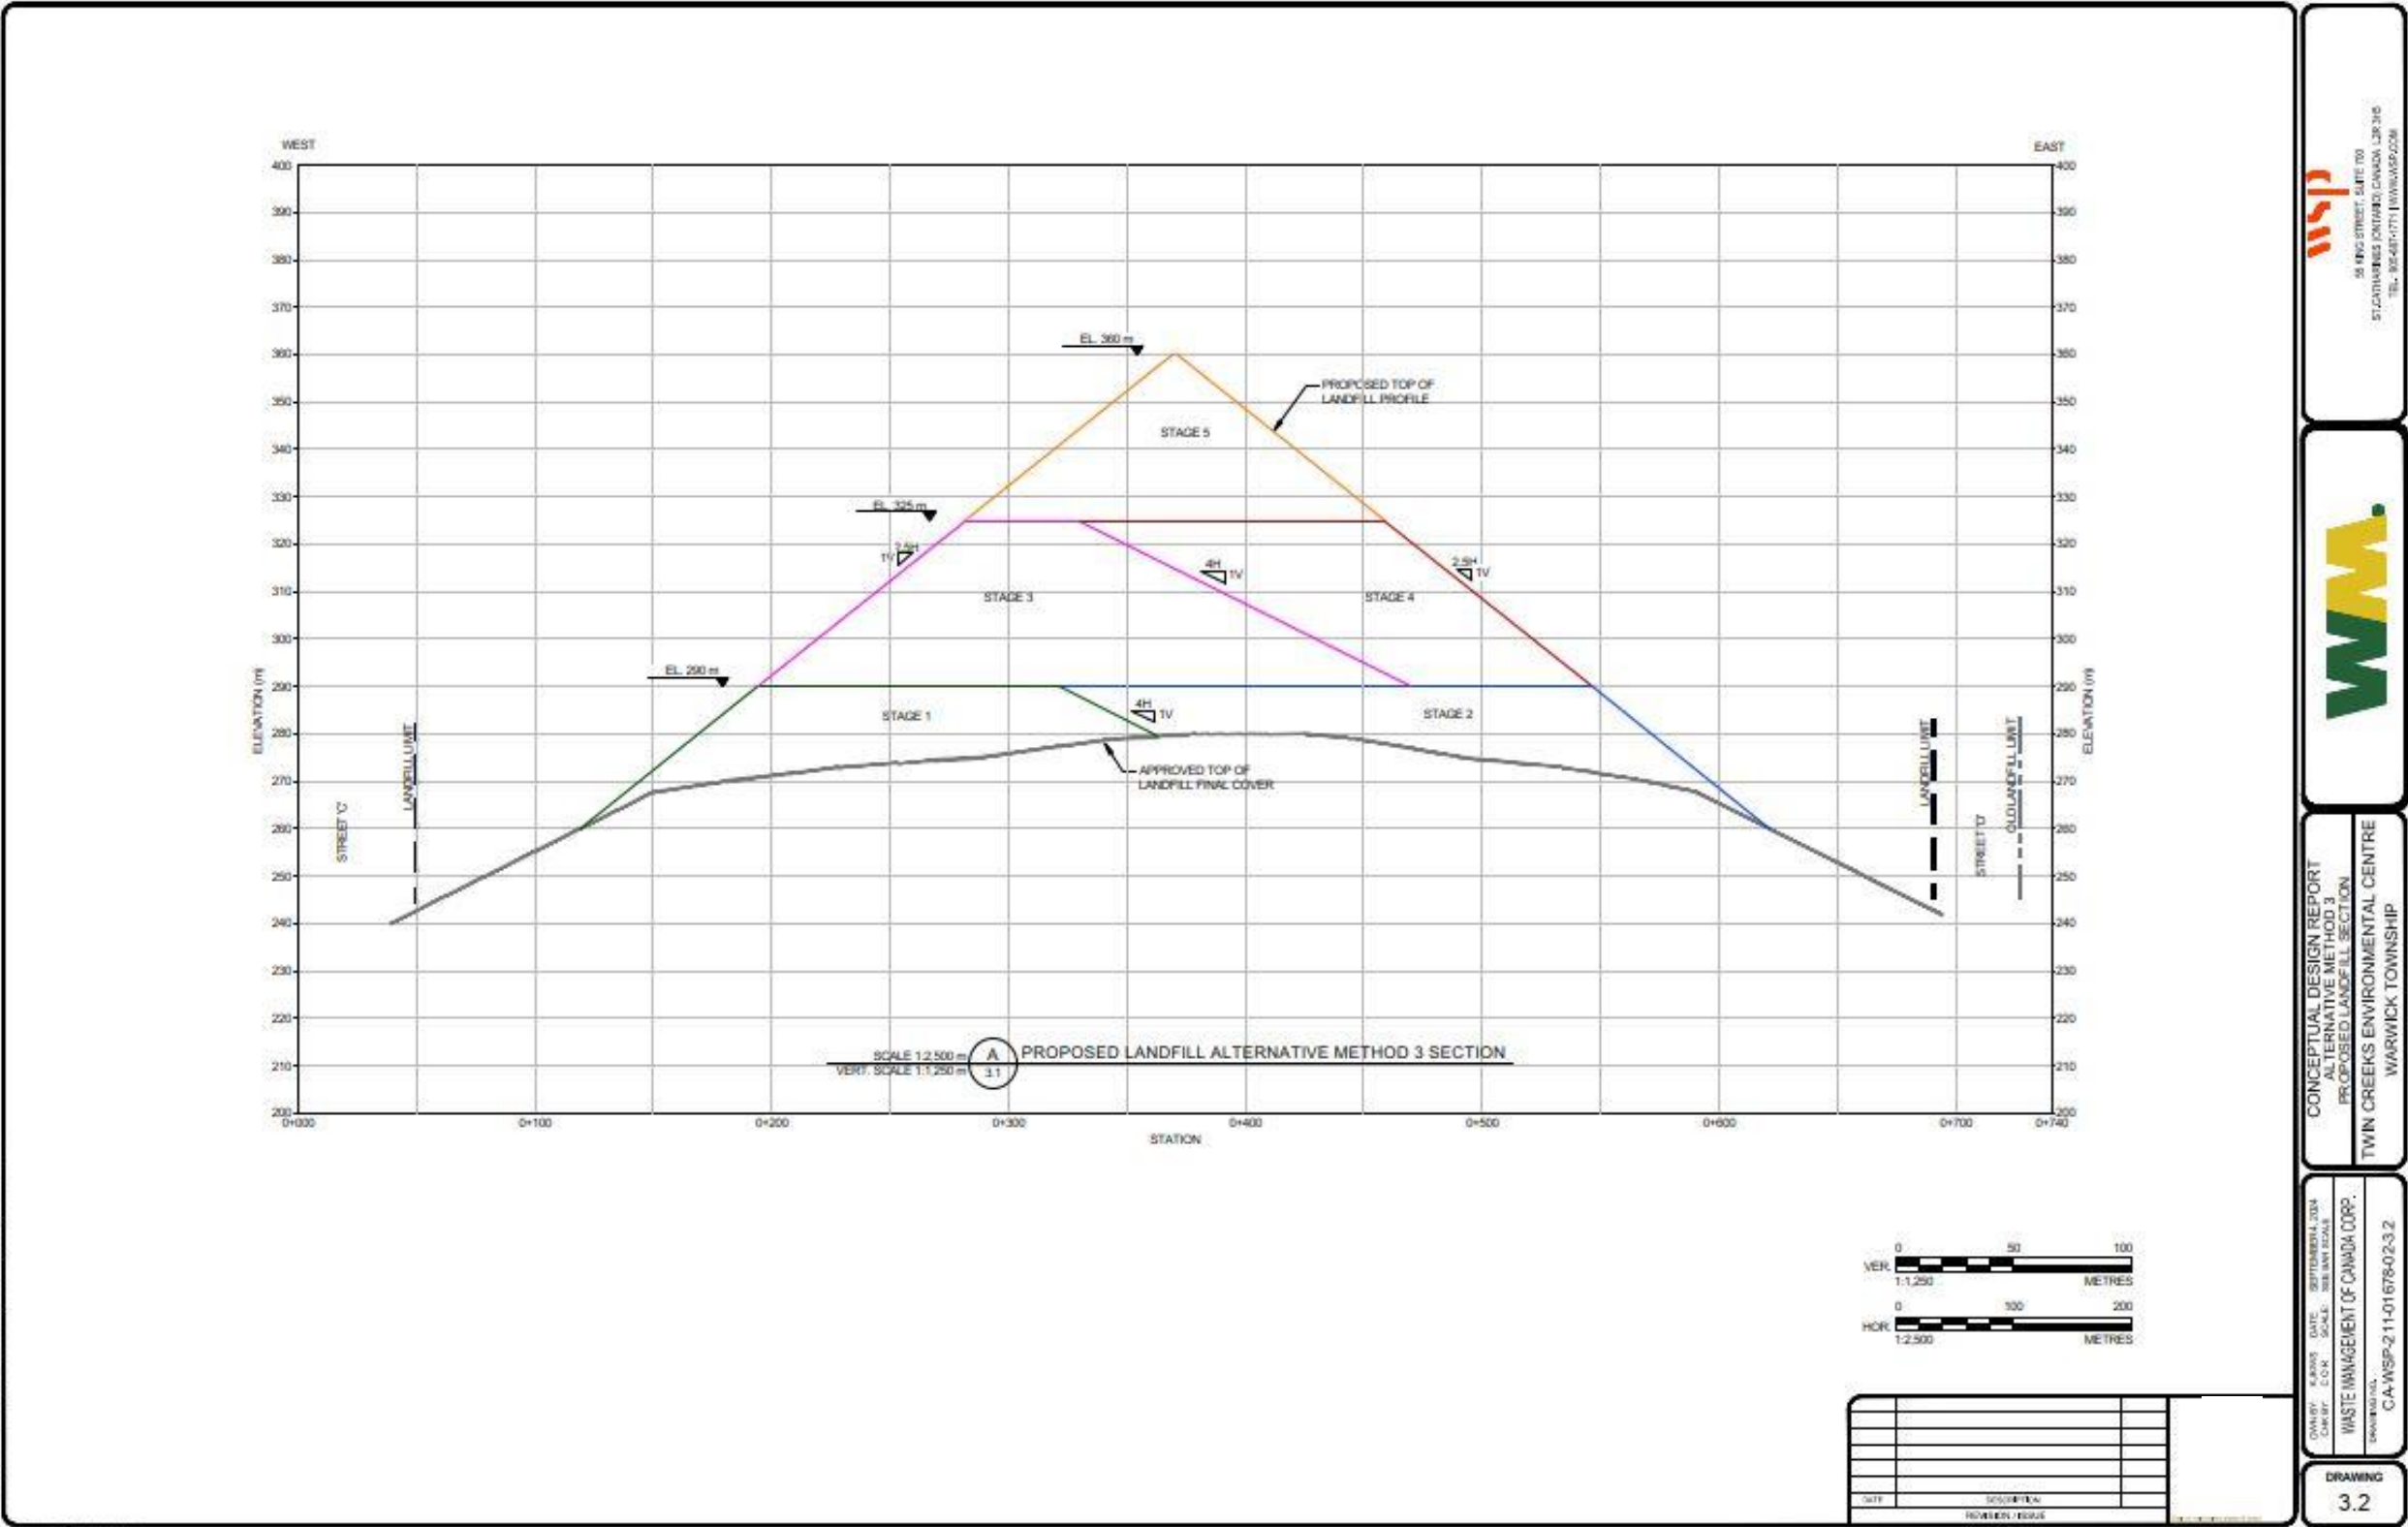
Alternative Method 3 Proposed Landfill Cross-section
